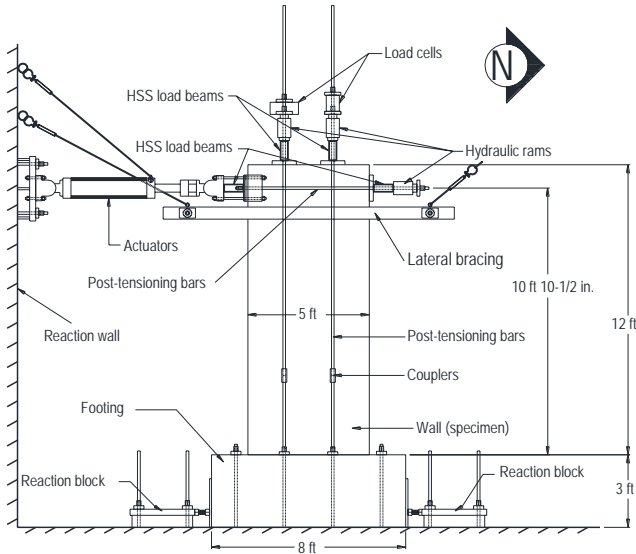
Test wall east elevation and setup (Note: 1 ft = 0.3 m)
